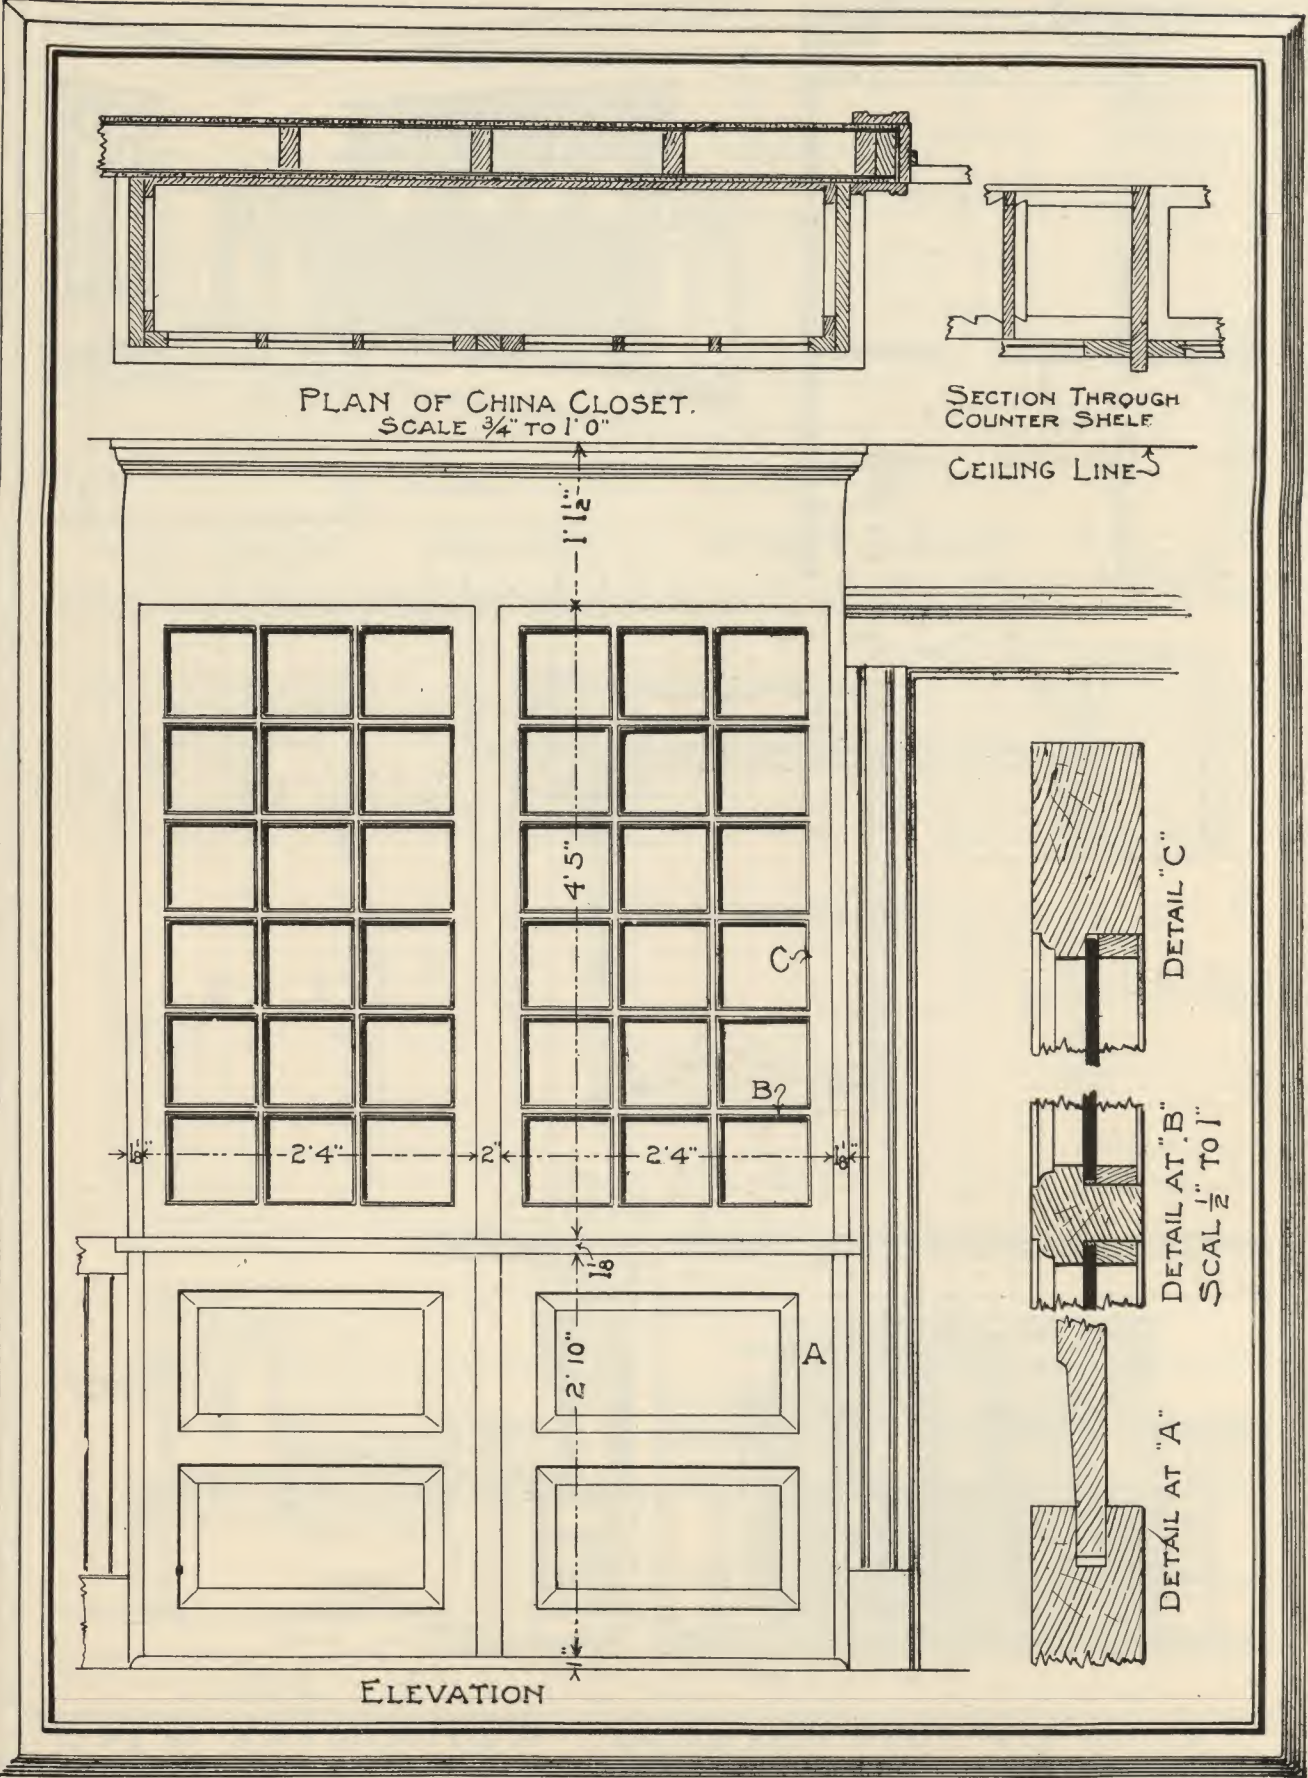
Plate XXII. Detail Drawings of China Closet Shown on Opposite Page.
